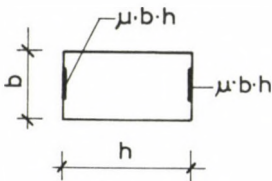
Symmetrically reinforced rectangular concrete cross section
